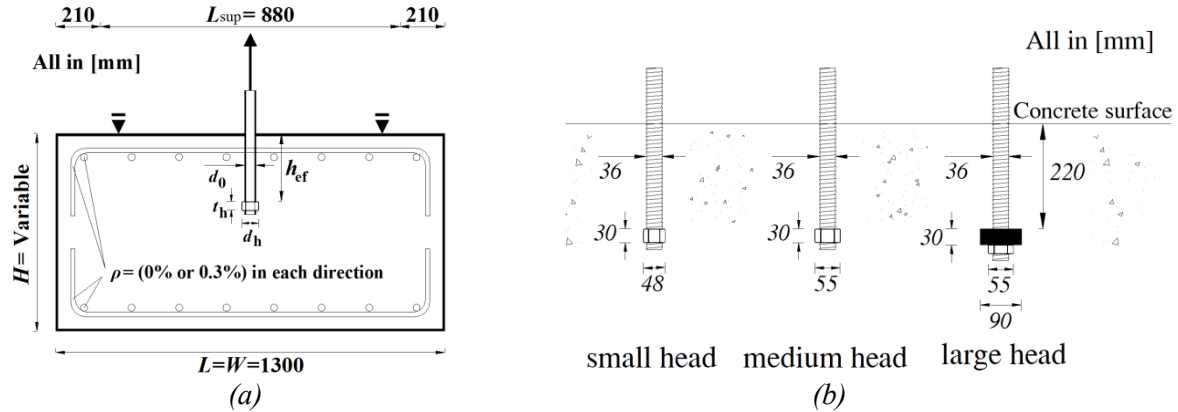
Typical geometry of (a) test specimens, and (b) tested headed anchors with various head size.
